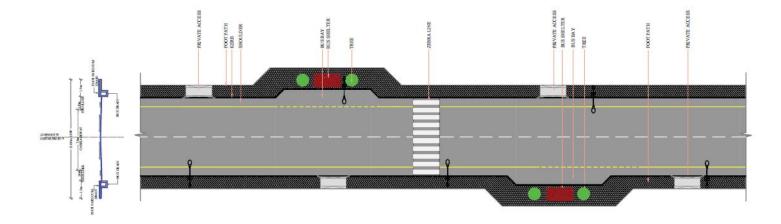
Typical cross section of 12m Right of way with 7m carriageway
